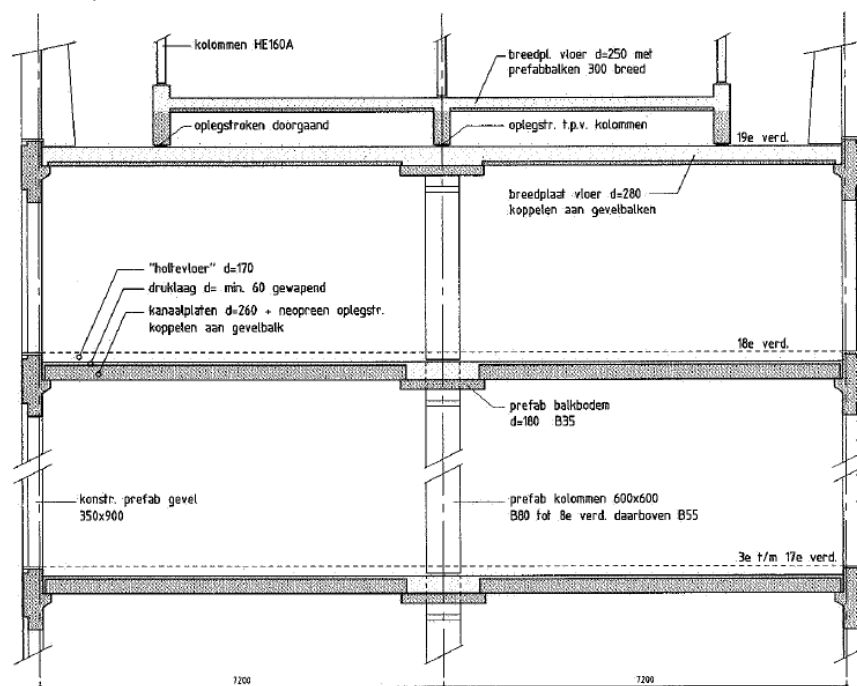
Principle section of high rise building (Drunen & Hendriks, 2017)
